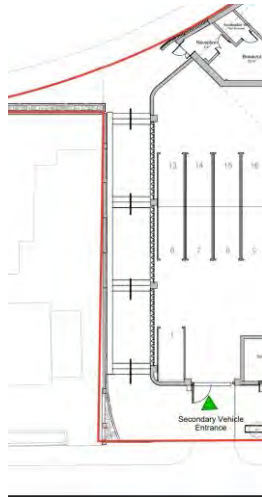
Plan of a footpath / cycle link to the west of the Kentish Town Police Station site, showing the steps needed
